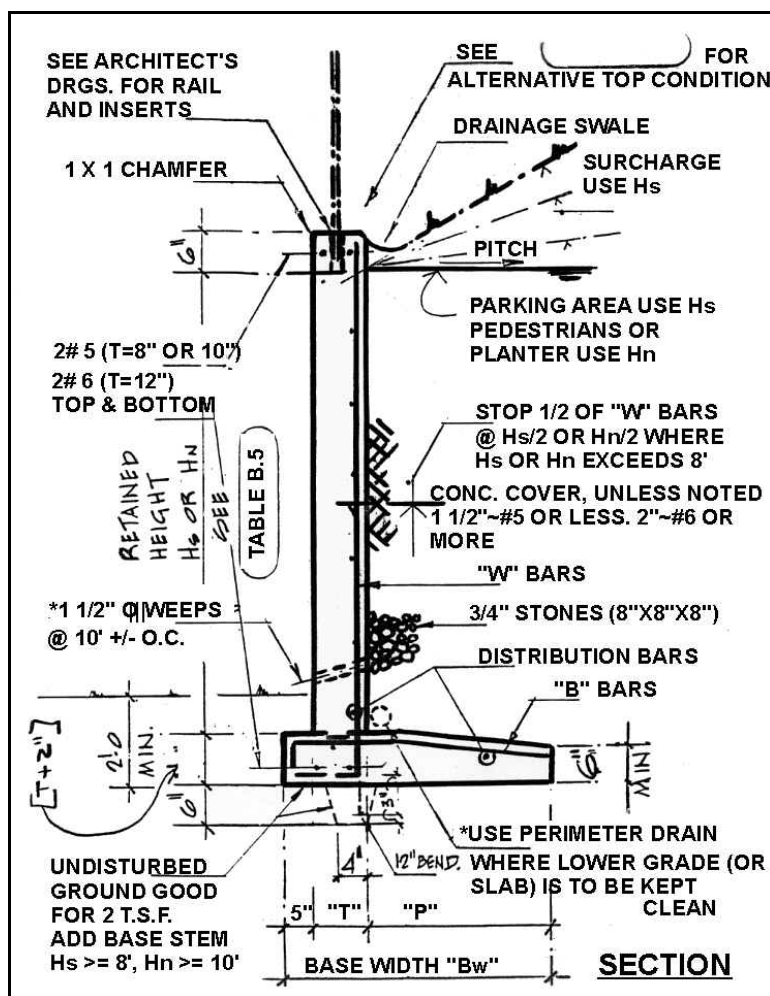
Concrete cantilever retaining wall, toe in. Height = 4 to 14 feet (Bernier, 1995).
